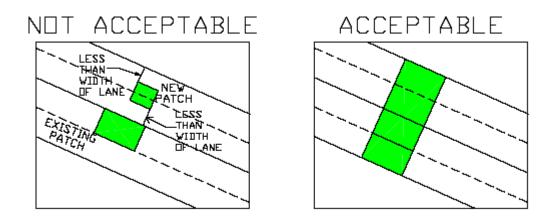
Example 3: Do not leave strips of pavement less than one-half lane in width.
